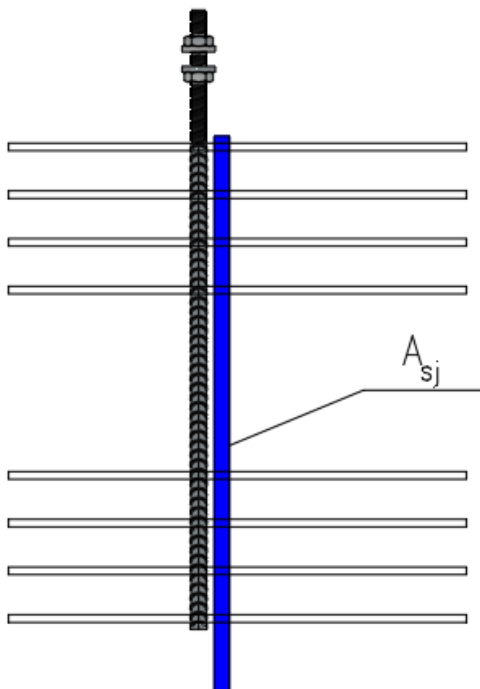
Lap reinforcement of SUJ/P anchor bolts
